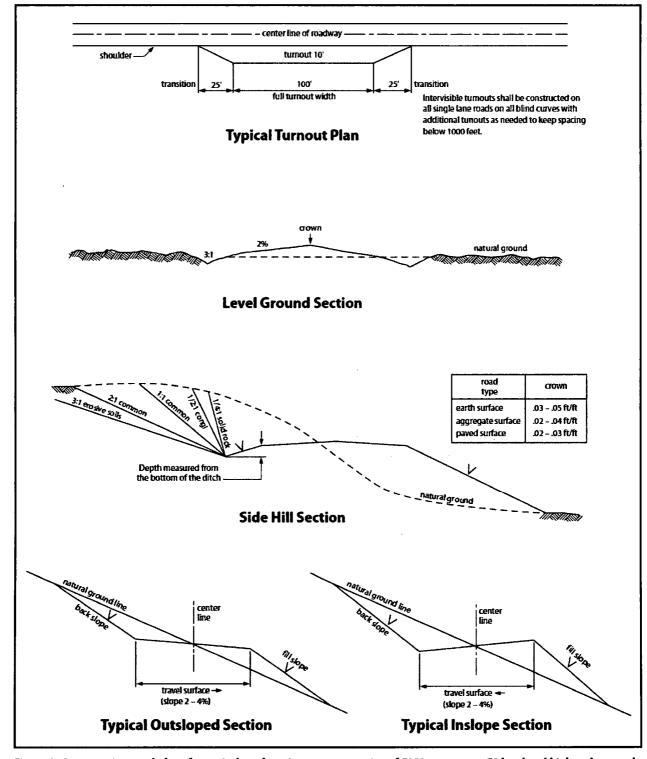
Cross-sections and plans for typical road sections representative of BLM resource or FS local and higher-class roads.
